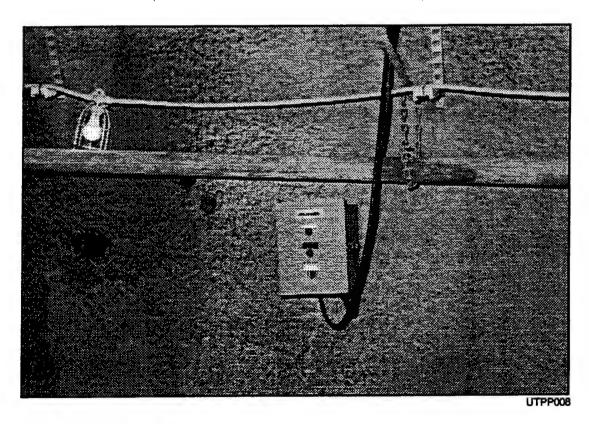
Typical Electric Switch for Water Pump at Bulkhead
